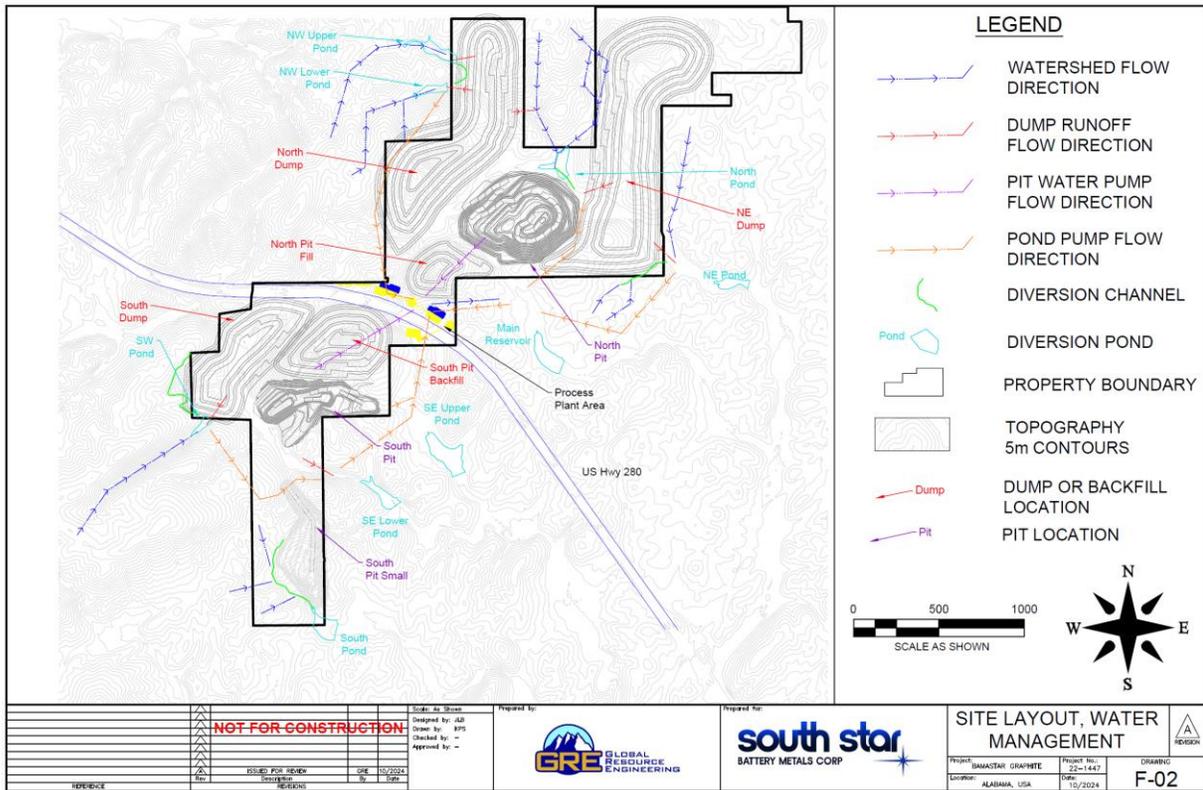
shows that the SW Pond, the NW Upper Ponds, and the North Pond are 'trapped water' locations which must be collected in a pond because the drainage is blocked by waste dumps. Water from these ponds and from direct precipitation landing on the pits will be prioritized for fulfilling mill water shortages. Because of its distance from the site, the South Small pit and pond diversions will not be incorporated into the makeup water collection system. This plan assumes that a pipeline will pass over the road on the same bridges used to convey South Pit material to the plant.
